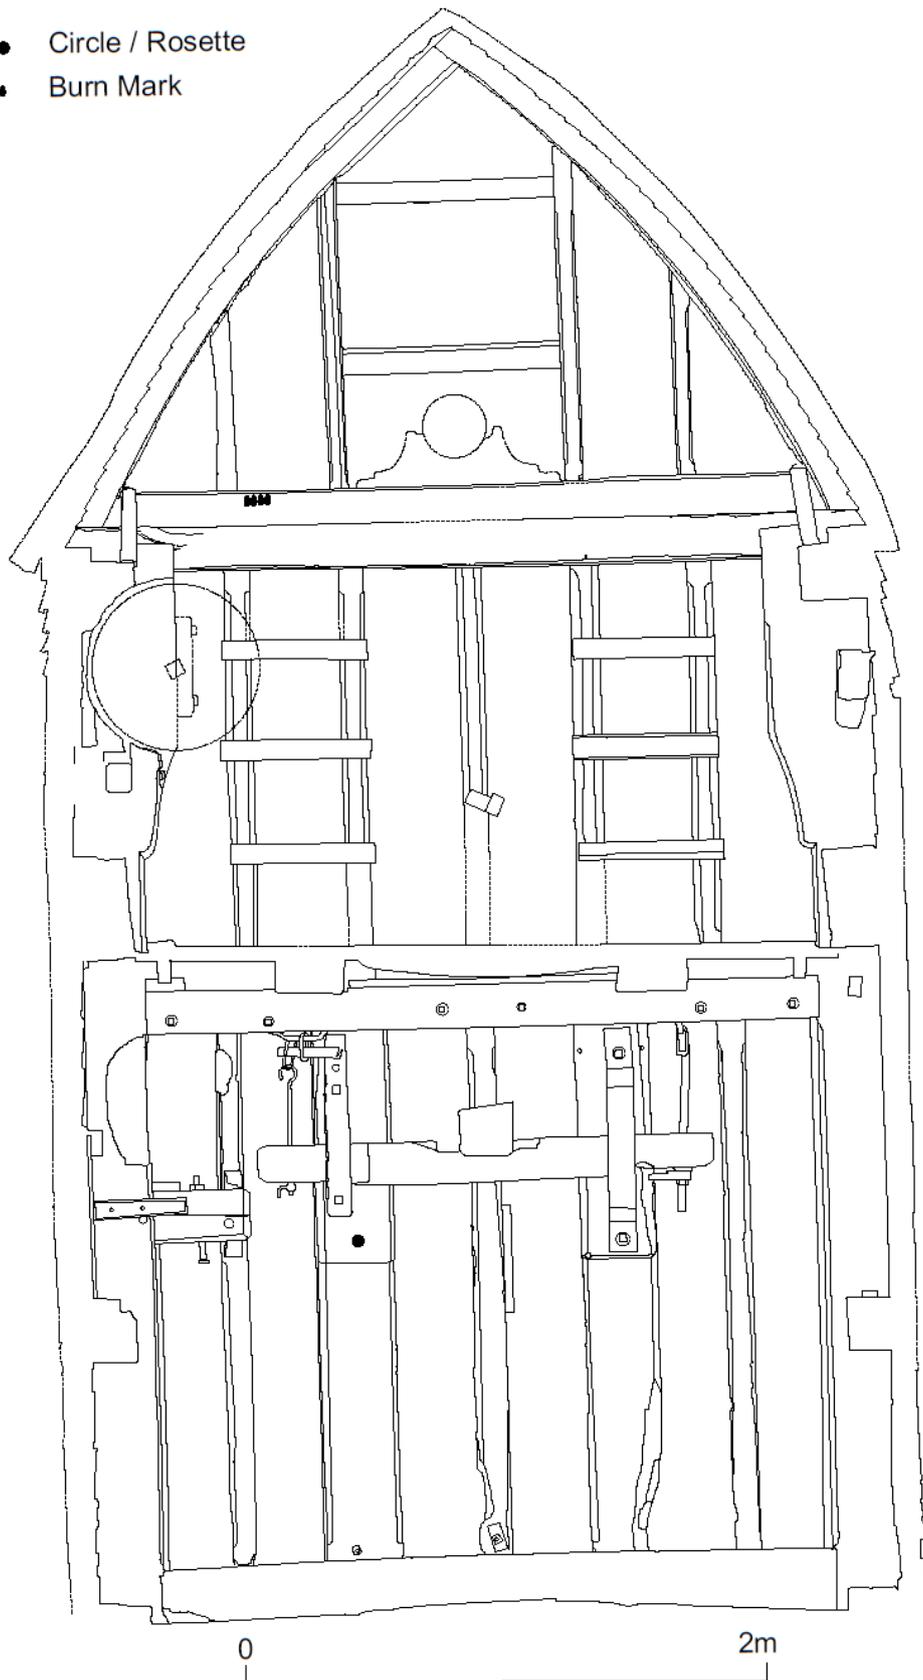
First and second floor, east elevation, showing location of the apotropaic marks
